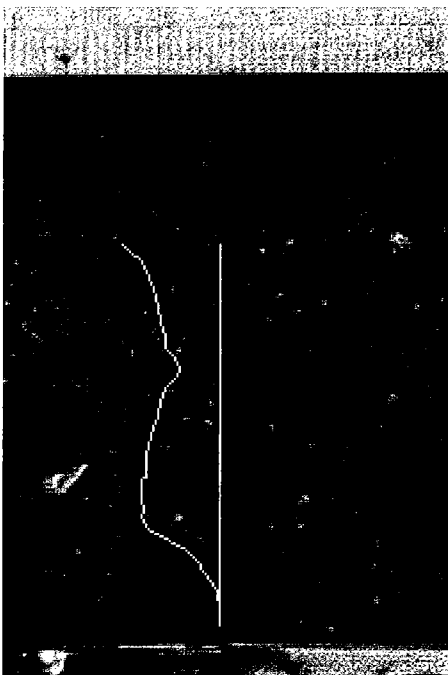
Electronically superimposed crack on unpainted beam - specimen HRA5HO2 (See Color Plate III at the back of this issue)
